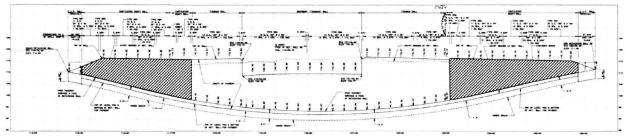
Composite sketch of northbound side of underpass. Shaded areas indicate locations of cantilever drilled shaft wall.
